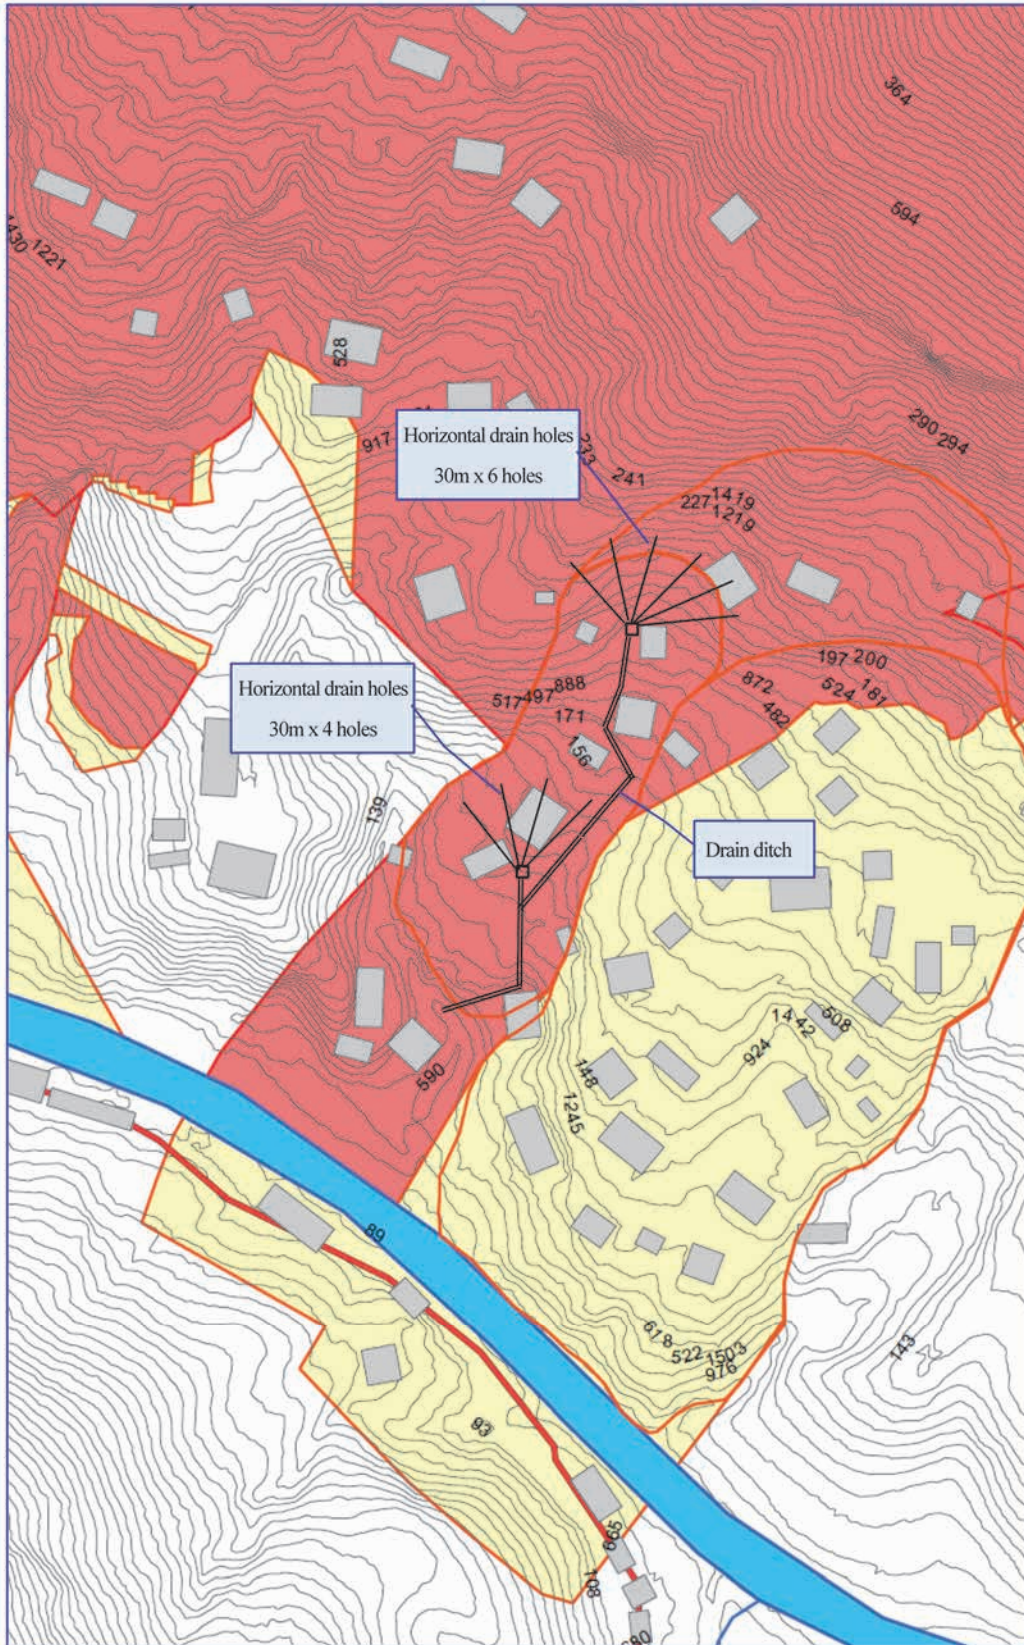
Layout of the Planned Structural Measures for Site 2 in the Udapotha Pilot Site
